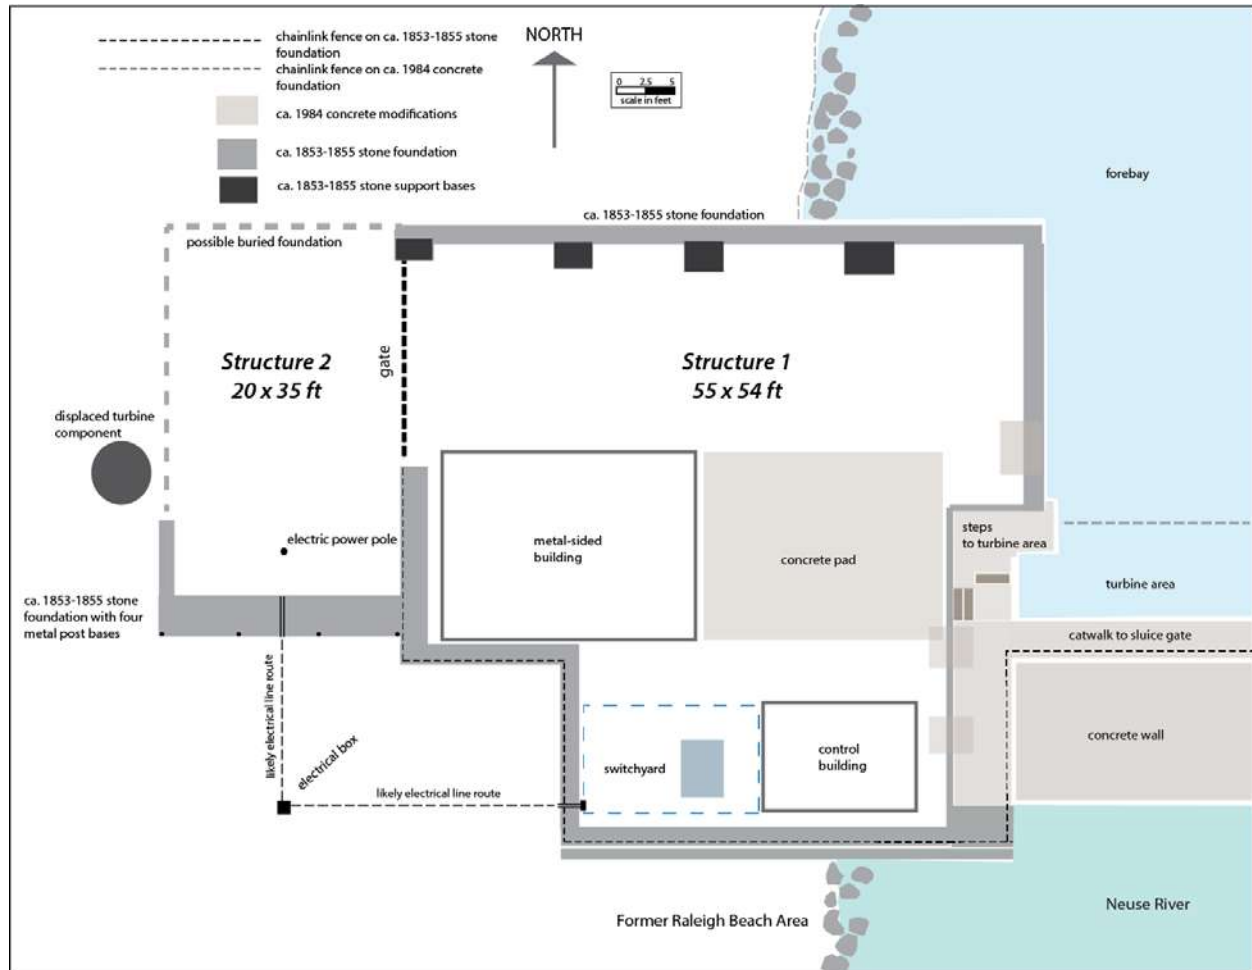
Site 31WA1872/1872 - foundation plan showing the ca. 1853-1855 Neuse Manufacturing Company papermill stone foundation (Structures 1 and 2) and the ca. 1984 Milburnie Hydroelectric Project modifications to the historic foundation.
